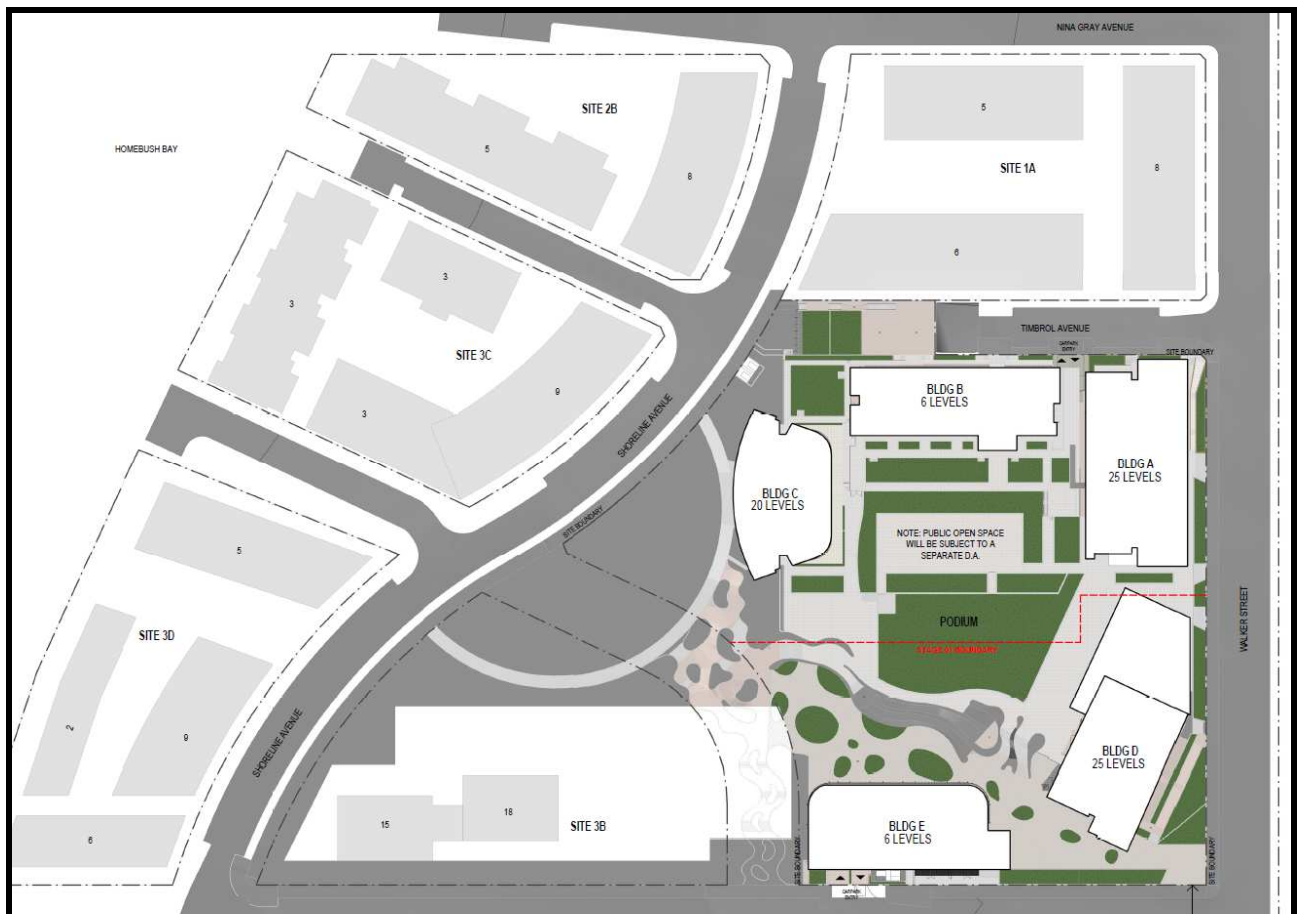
Location and approved layout of the Walker Street, Rhodes development
